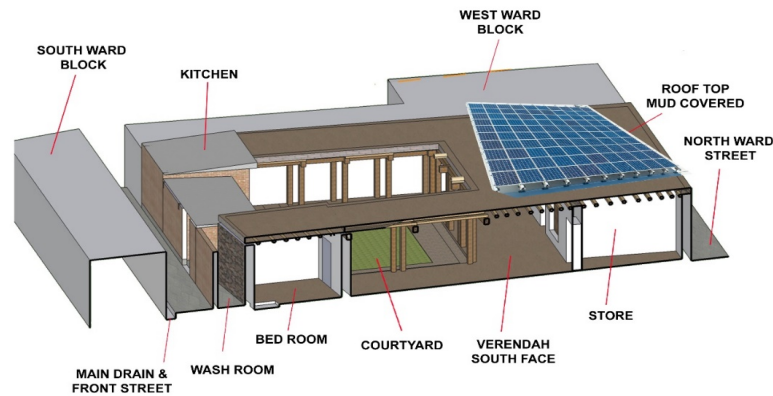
A sectional 3D-View Highlighting details, elements and spaces of the selected house.
